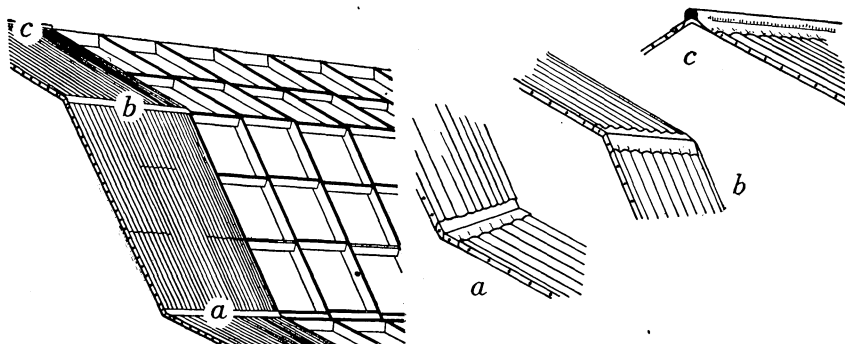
Corrugated metal roof without sheathing: a, Eaves joint; b, hip; c, ridge cap. Headers are staggered to permit nailing through rafters.
